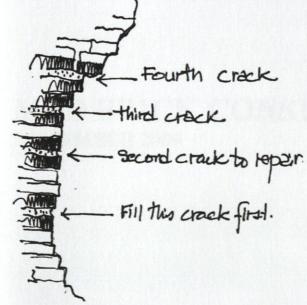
Sketch of wall section with multiple horizontal cracks showing sequence of crack repair.
